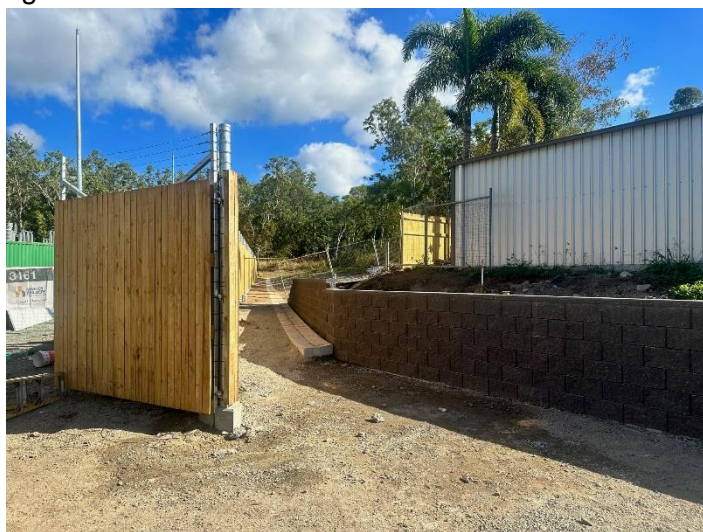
Retaining wall at the front of the substation was completed in late June.
